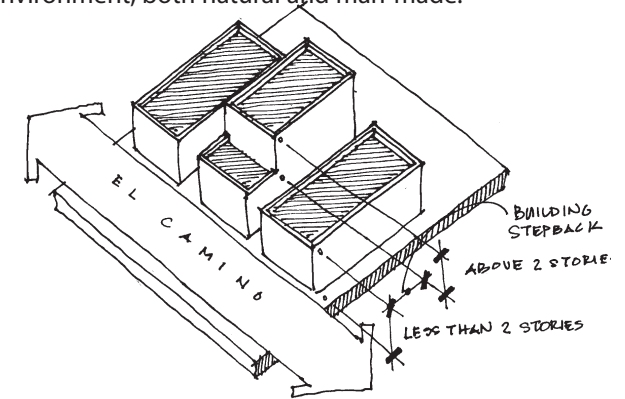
Upper story building stepbacks allow larger buildings to fit within the scale of lower buildings along El Camino.
